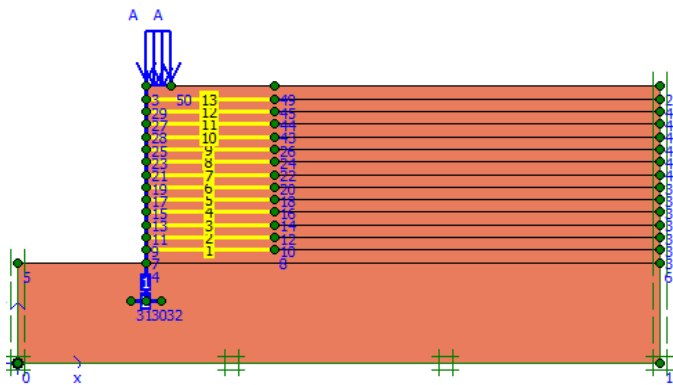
Reinforced Earth Retaining Wall with Clayey Sand used as a Backfill Material
